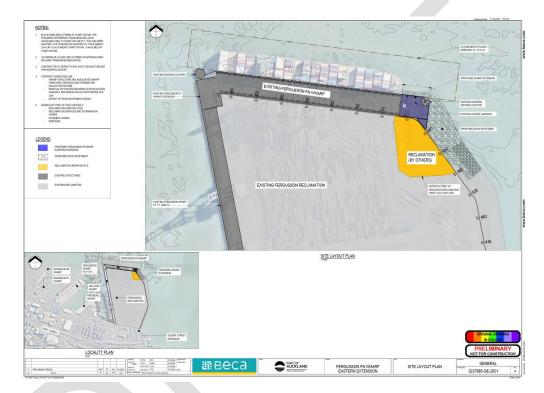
Site Layout Plan (Reproduced from 'Attachment 6 - Proposed Plans')
